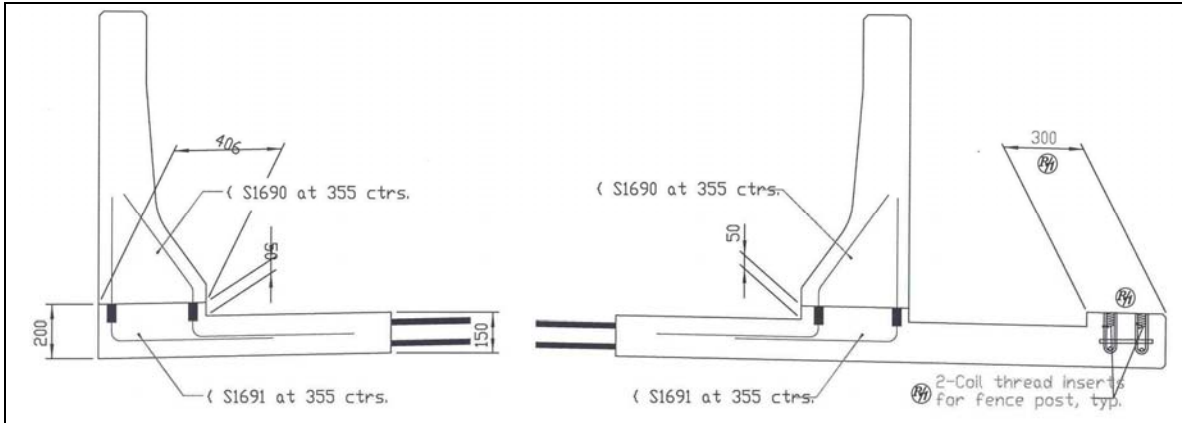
Barrier curb pedestal in NU-Deck panels (NDOR, 2002)
